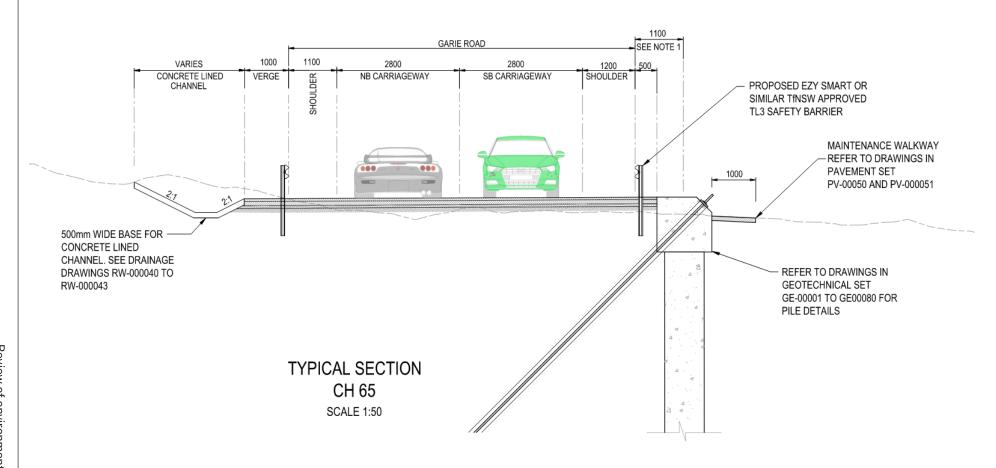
Cross-section of the proposed piled wall with rock anchor, retaining wall and new guard fencing
